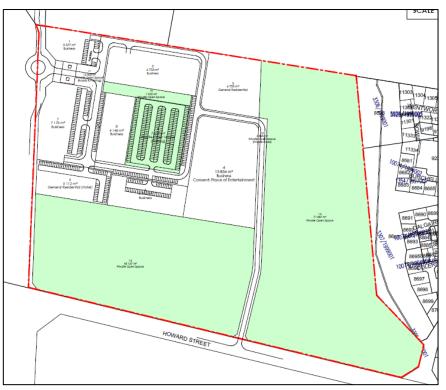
PROPOSED PRIVATE OPEN SPACE ZONE ERVEN
